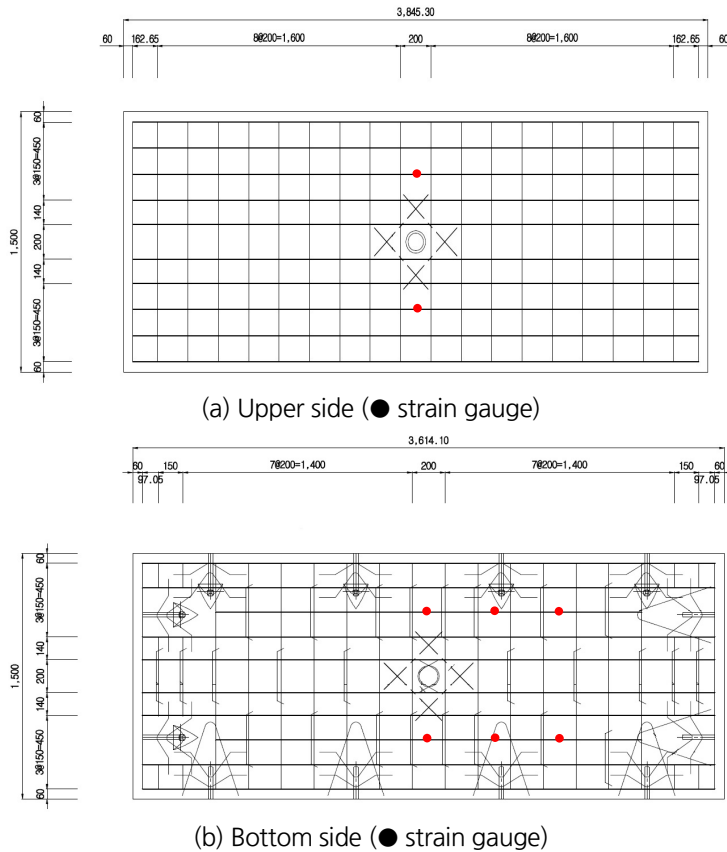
Arrangement of rebar and strain gauges (unit: mm)
